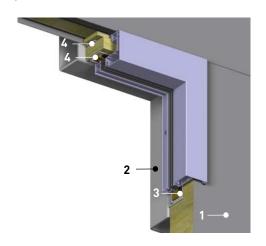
Window frame, installed at top and bottom joint; side edges above
